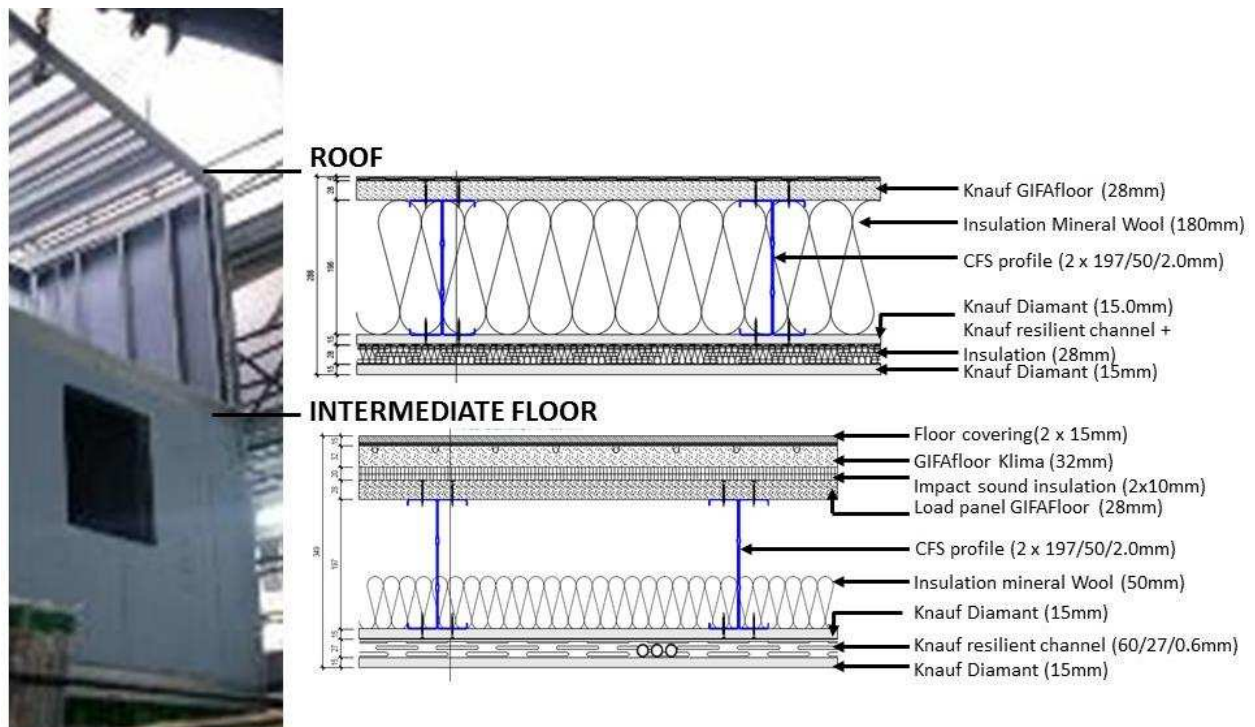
ELISSA house section, with indication of floors and roof stratigraphy.
